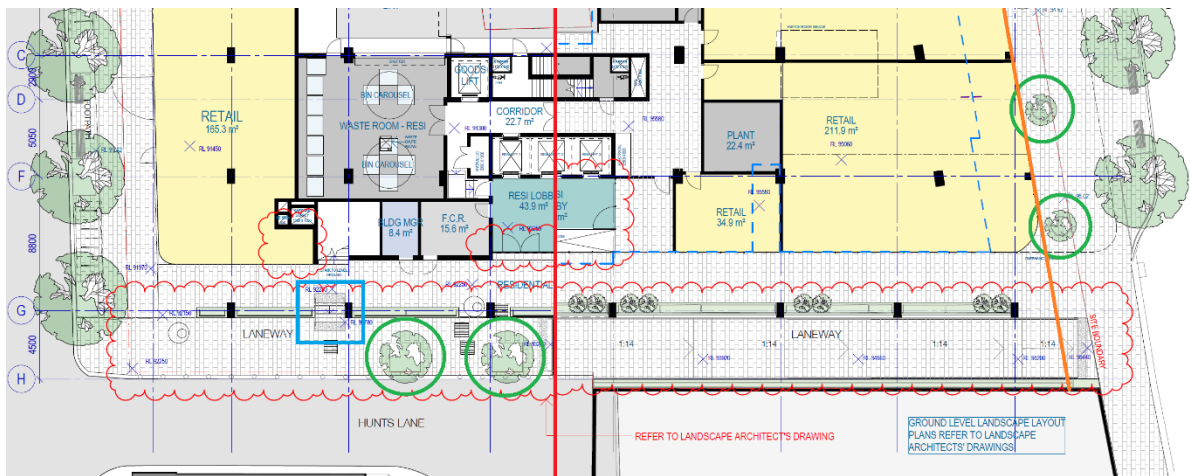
Revised proposed through-site link. Red line represents split plan between lower ground Rawson Street level (left) and upper ground Beecroft Road level (right).
